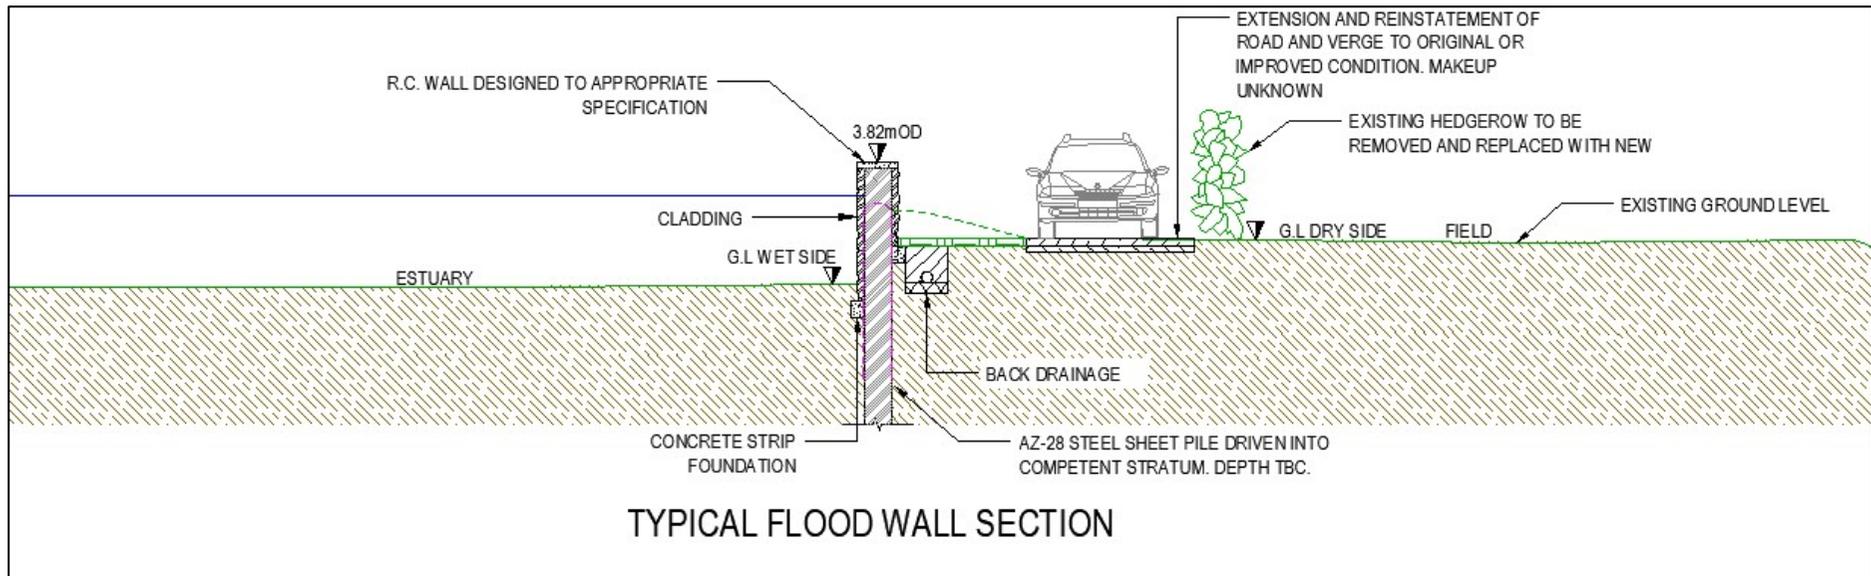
Cross section of a typical flood wall at Marsh Lane
